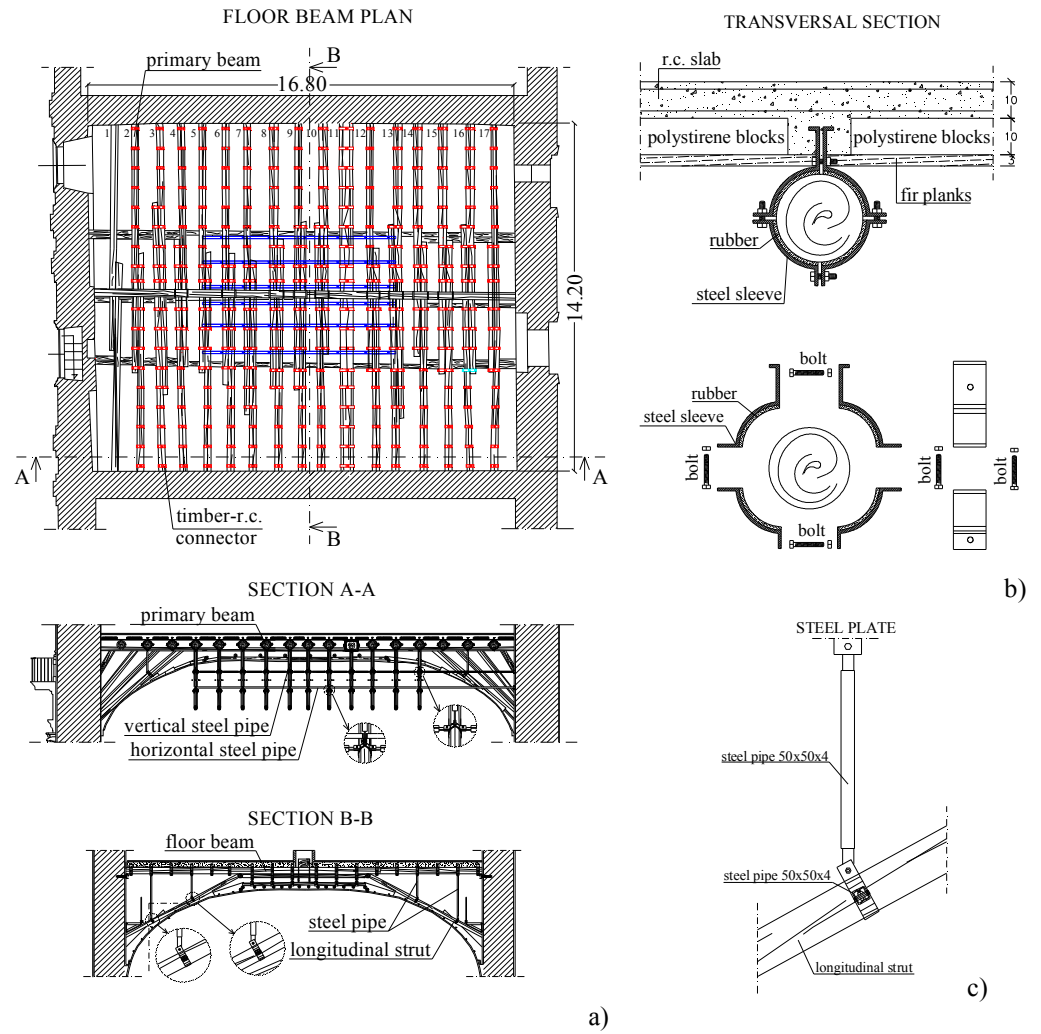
Diplomatic Hall (II) – Retrofitting interventions – Beam floor: a) Plan and sections; b) Timber beam-slab connector; c) Stiffening systems for longitudinal struts.
